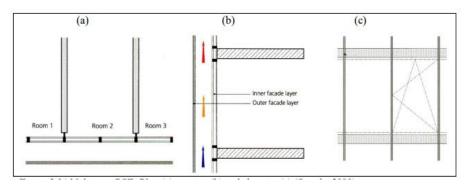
Multi story DSF: (a) plan, (b) section, (c) elevation (Azarbayjani, 2010)
